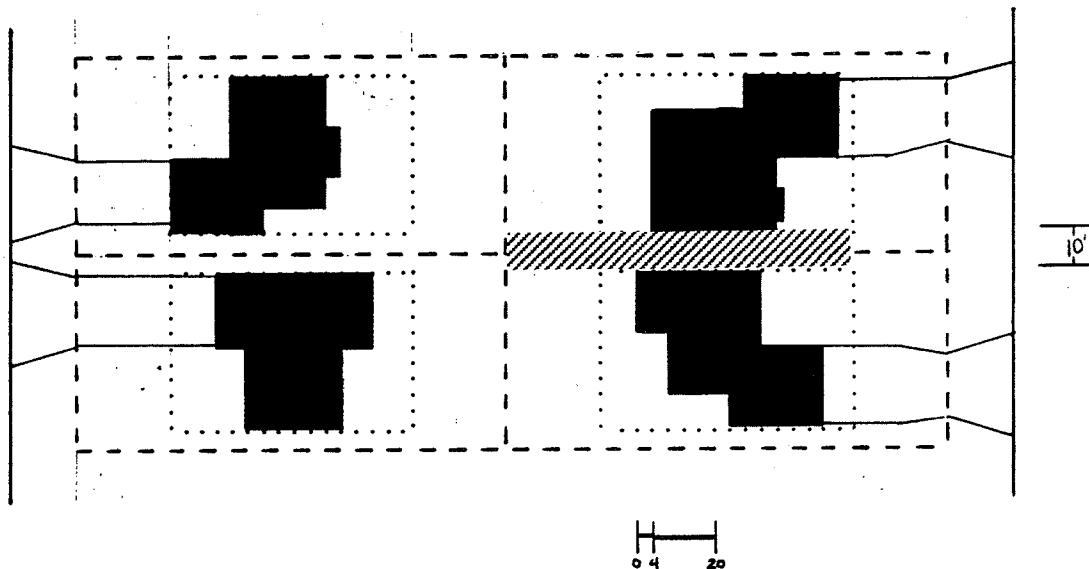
10-foot Planting Strip where Driveways Opposite
